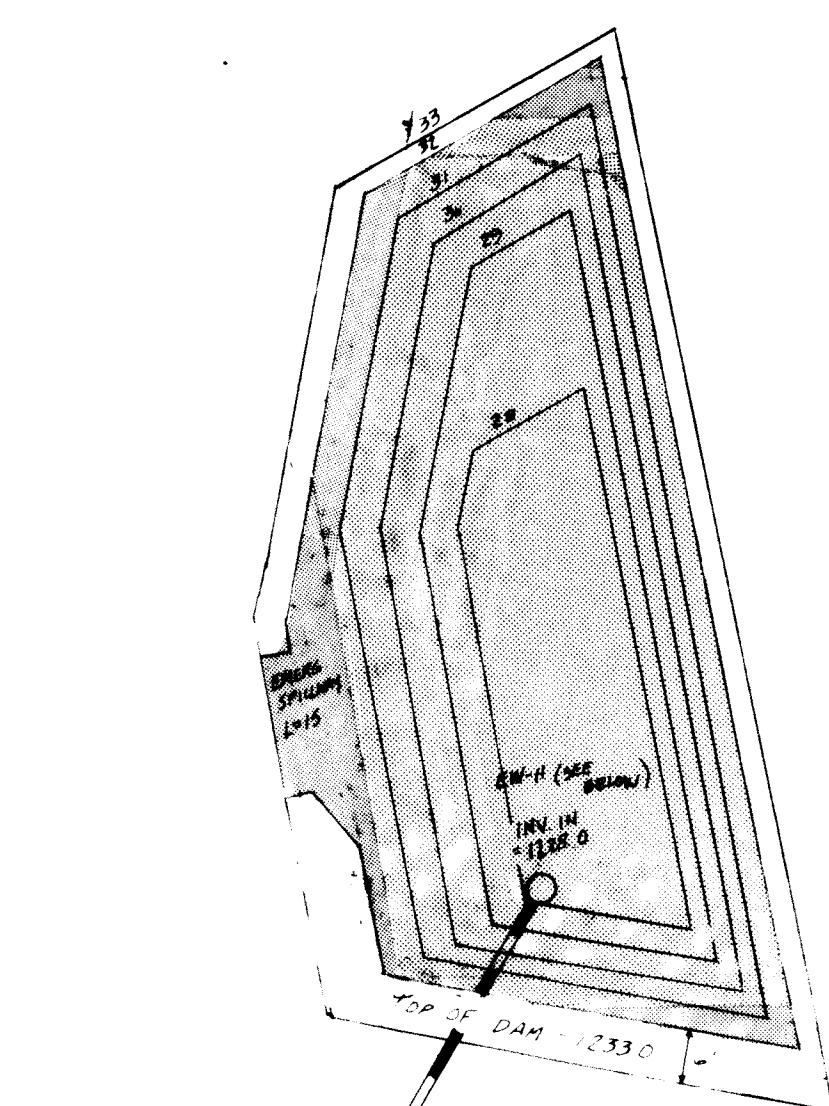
PLAN PROFILE D.P.R. & E. STANDARD
